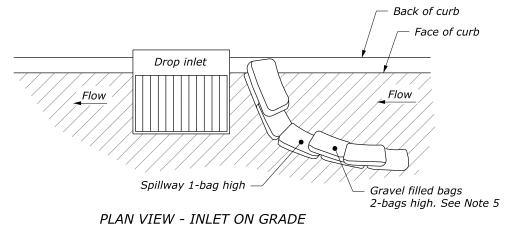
DETAIL APPROVED FOR USE --/----DETAIL REVISED: 7/2016 W157-2
